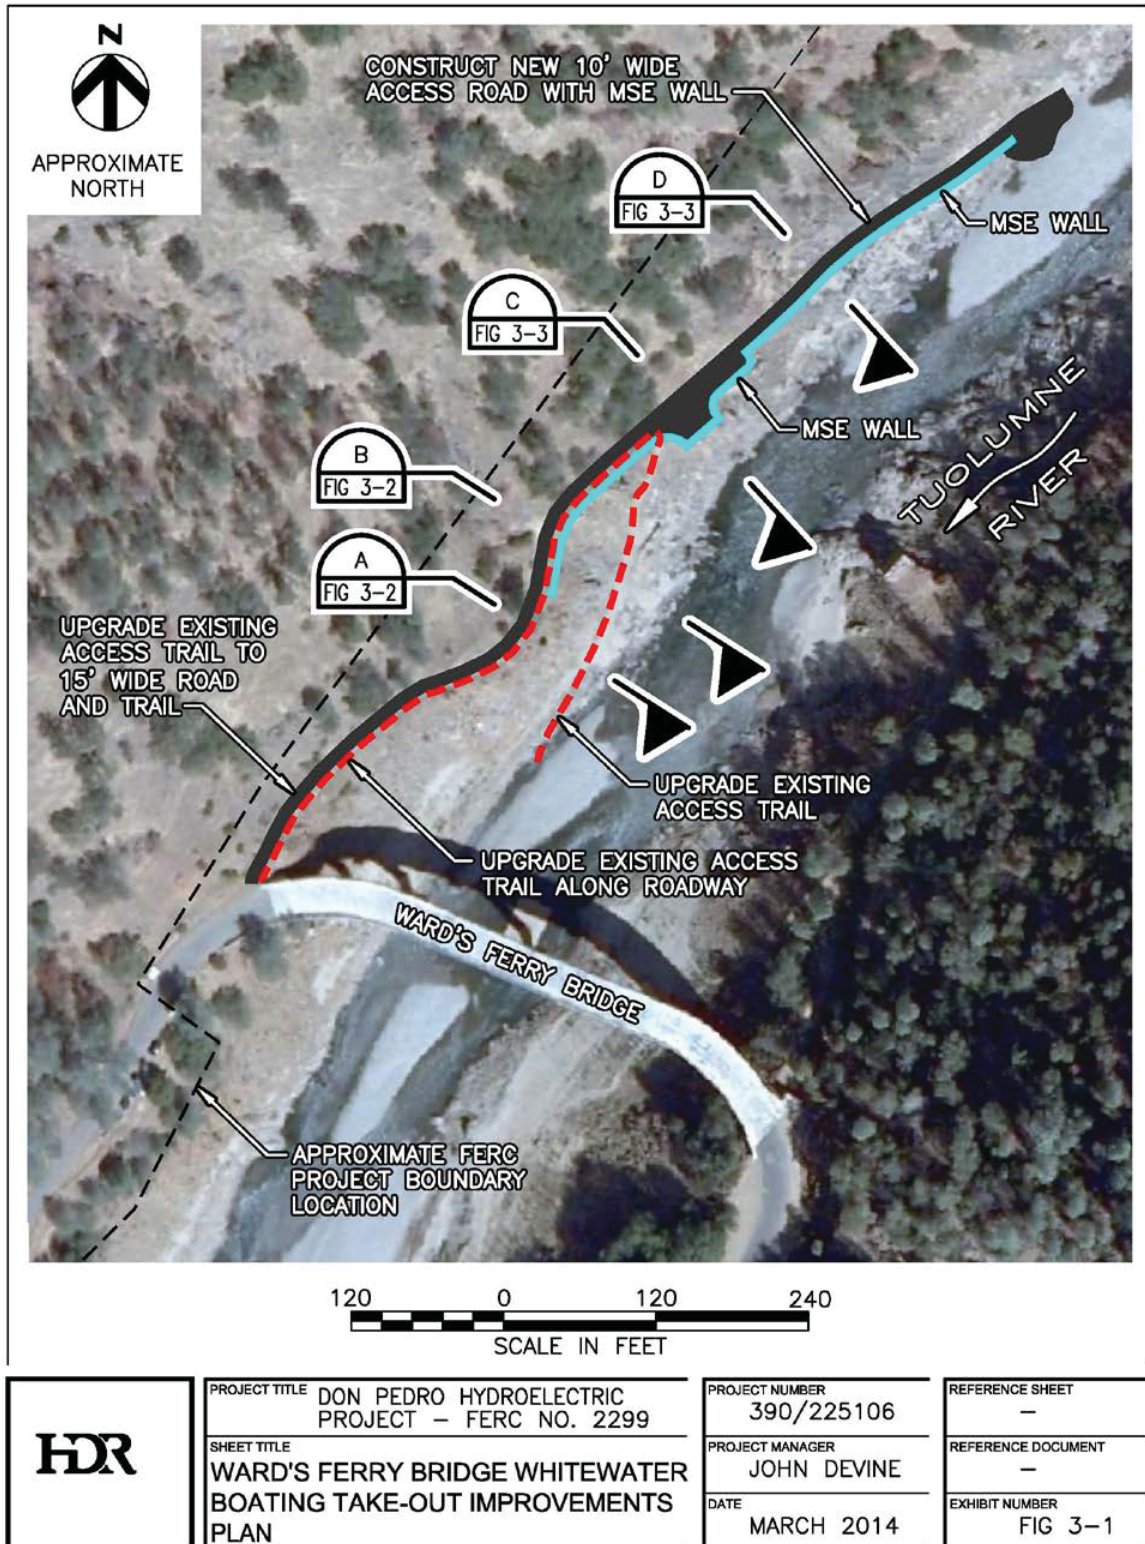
Ward's Ferry Bridge whitewater boating take-out improvements – plan view.
